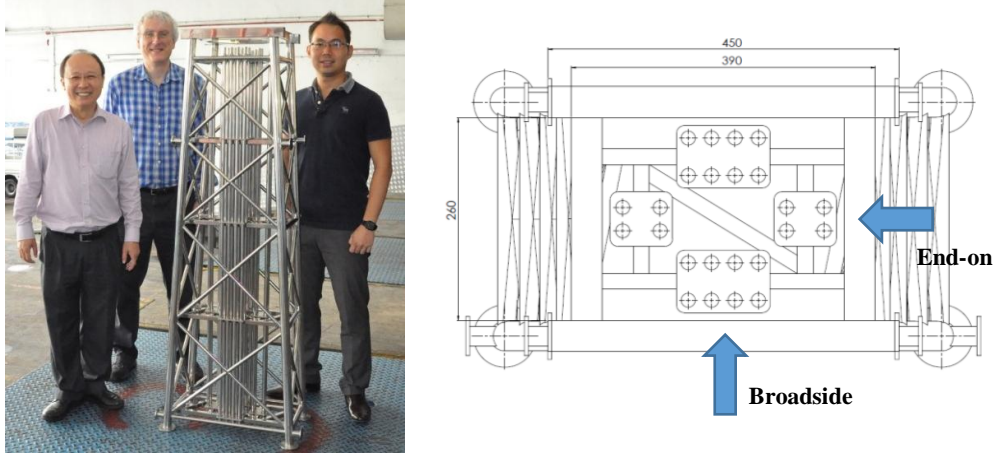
(Left) 3D view of the jacket model and (Right) plan view of the model showing the arrangement of conductor arrays.
